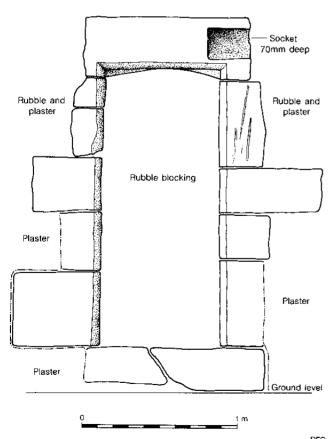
Elevation of Period 9 doorway inside Birdoswald farmhouse
